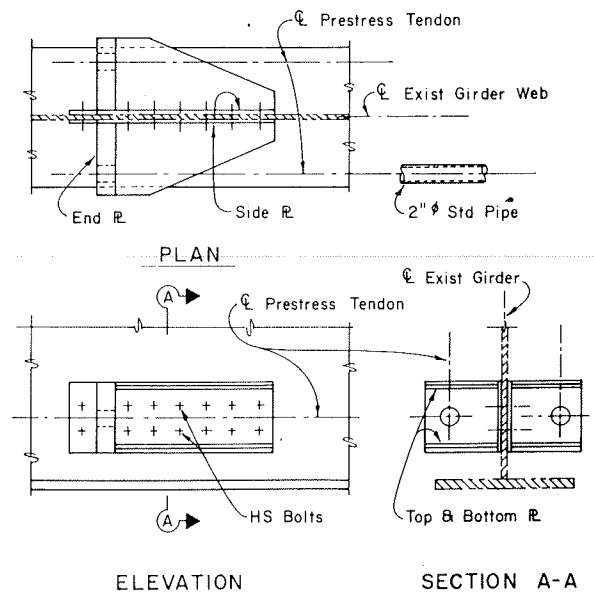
Prestress tendon anchorage—positive moment zone.
